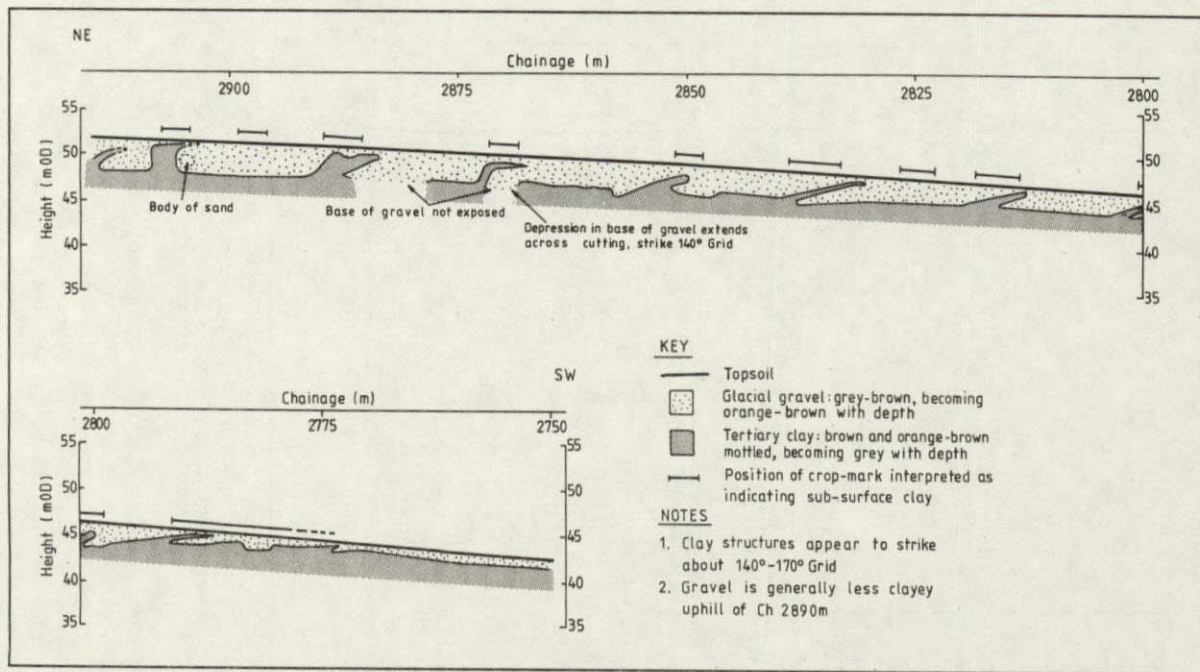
Stanstead Abbots: Vertical section through south-east face of cutting.
